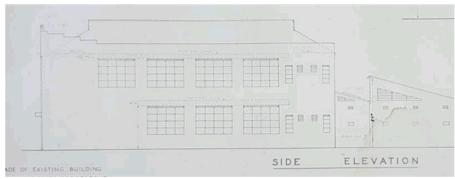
1937 drawings - detail of the east elevation of the new section (PROV, 1937).
